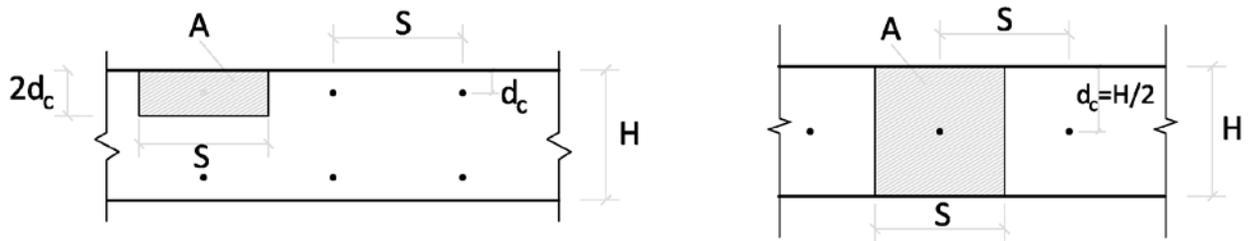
Determination of effective tension area of concrete surrounding the tension reinforcement for an axially tensioned concrete member.
